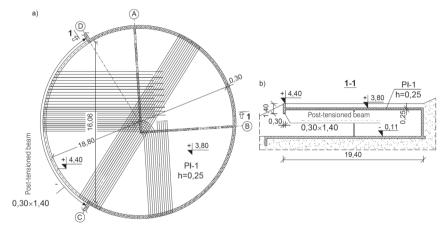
Music Pavilion's plan (a), vertical cross-section (b)
